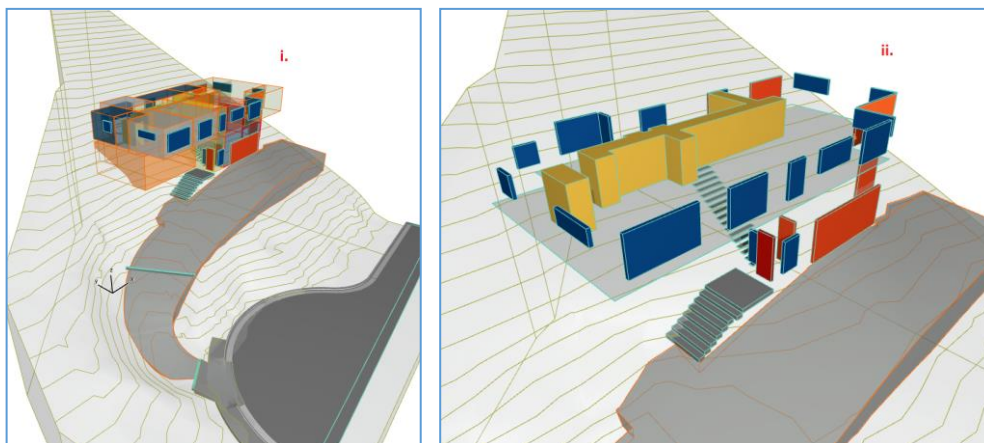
Additional zone-stamps for indoor navigation purposes. The windows are indicated with blue objects, the door with red. The entry door is dark red. i.) All zone-stamps are activated ii.) Some zone-stamps are hidden in order to be able to see the internal horizontal pedestrian corridor marked with yellow. The stairs are indicated with grey. (Created by: F. Acs)
